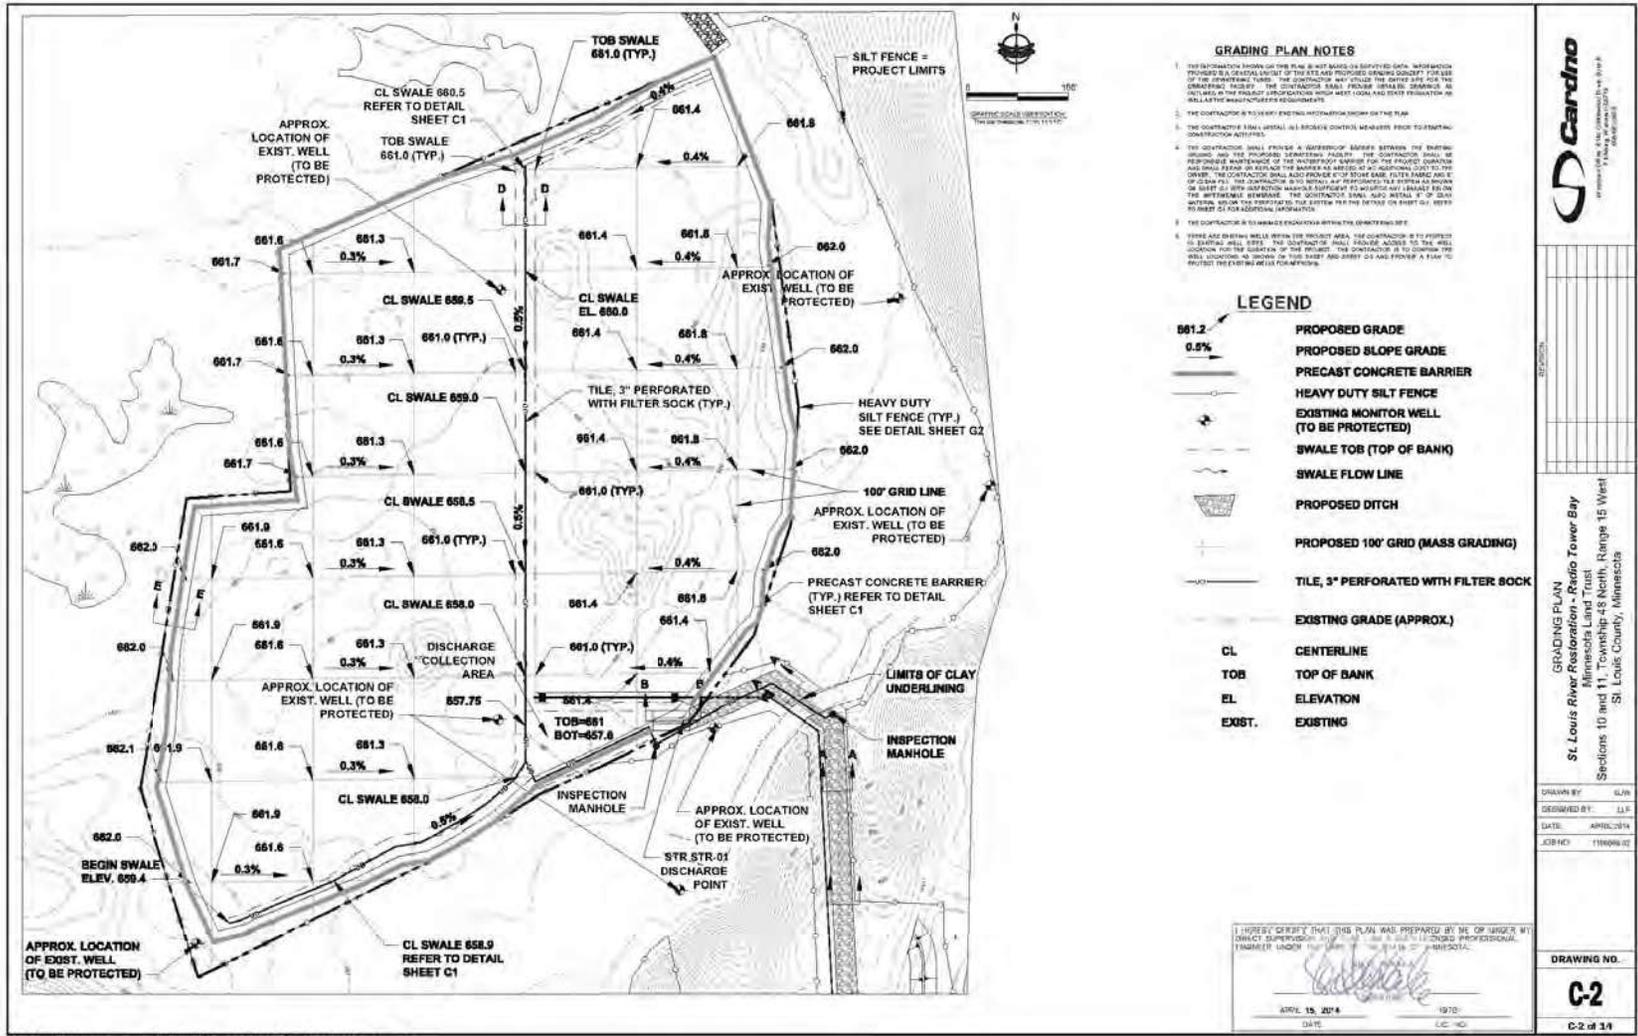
Construction Plan Sheet C-2: Grading Plan.
